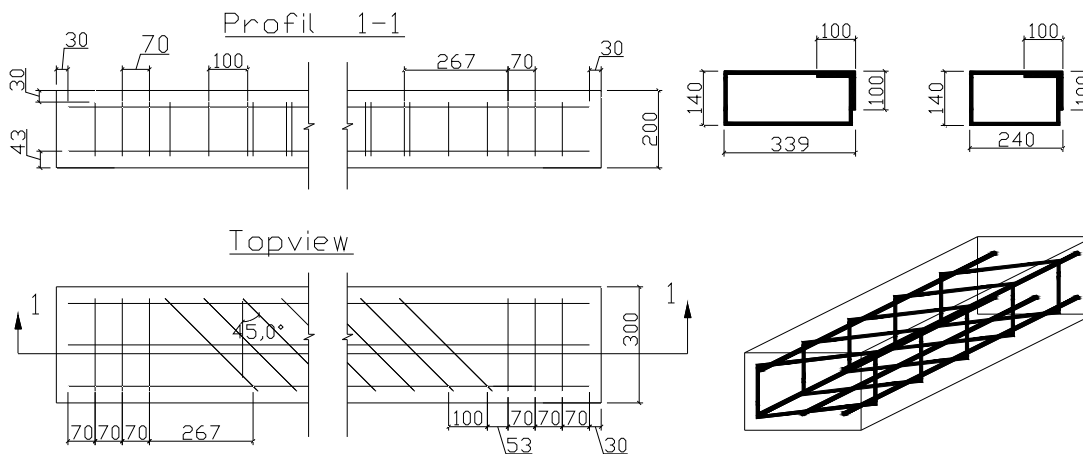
Geometry and steel plan of test specimens in Series 2 (TR-direction spacing)
